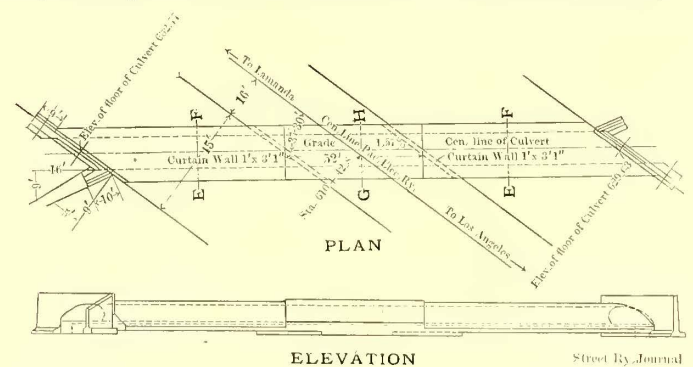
CONCRETE CULVERT ON MONROVIA LINE
